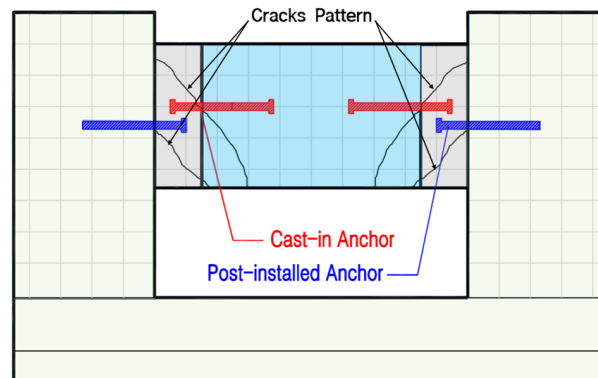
Initial cracks developed at the connection of the RC member and advanced into breakout failure.
